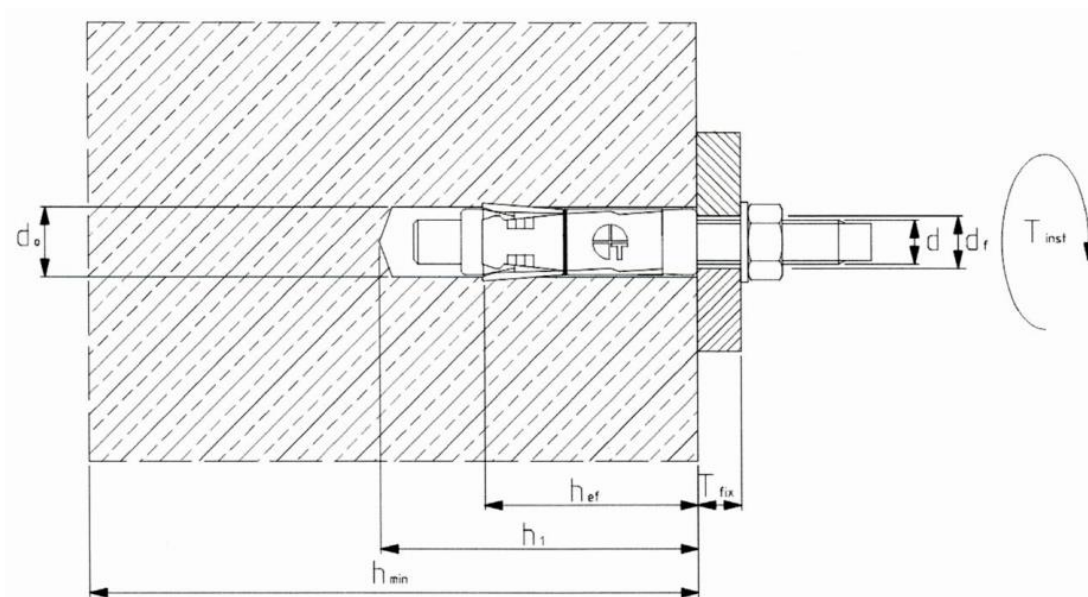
Installation parameters of TSA, TSA P, TSA L, TSAE and TSAH fasteners in concrete
